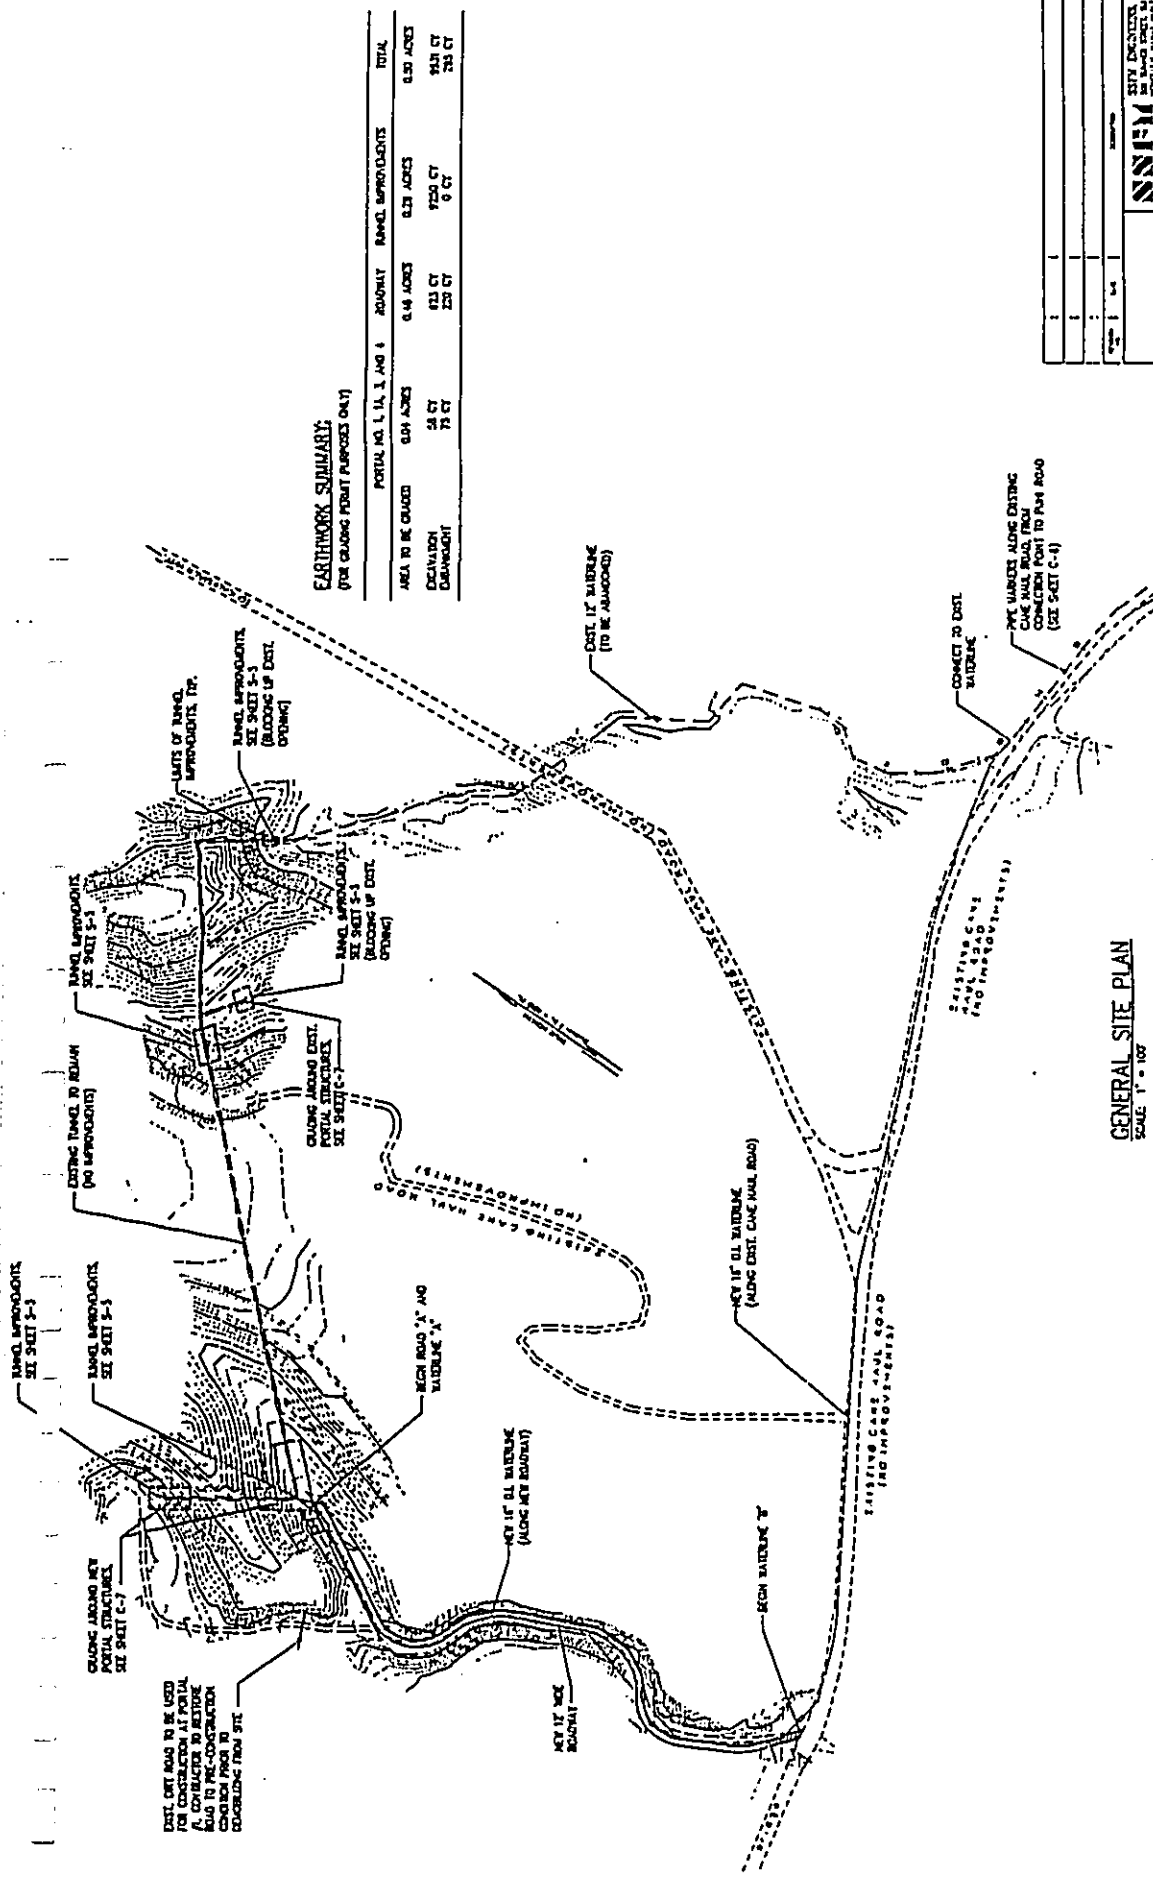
Kokolau Tunnel - Existing Layout Plan (Scale 1" = 40')
